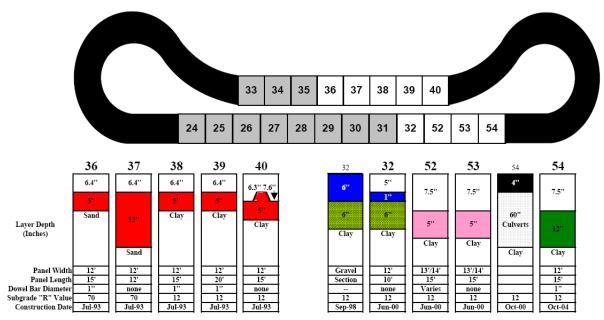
Layout of Mn ROAD Low Volume Road Sections
